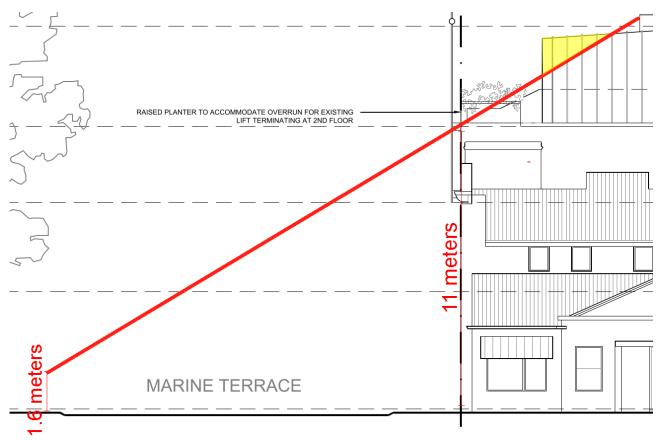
Annotated plan showing the planter and lift run visibility of the additions from the street taking into account the height of the existing building façade.
